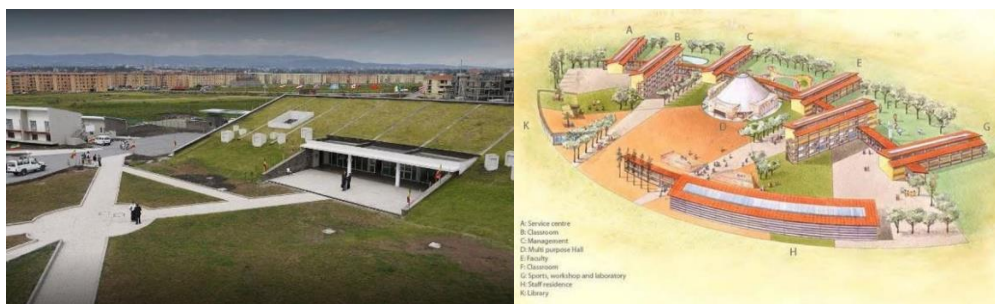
&10: Hope College of Business, Science and Technology, overall site plan and Green Roof of HUC (Source:(<http://www.hopeuniversitycollege.org/>))
